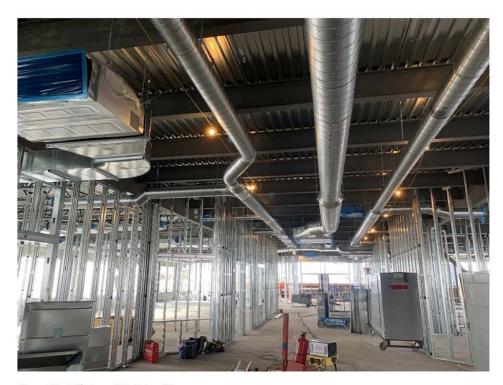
2<sup>nd</sup> Floor of Building 3B.
